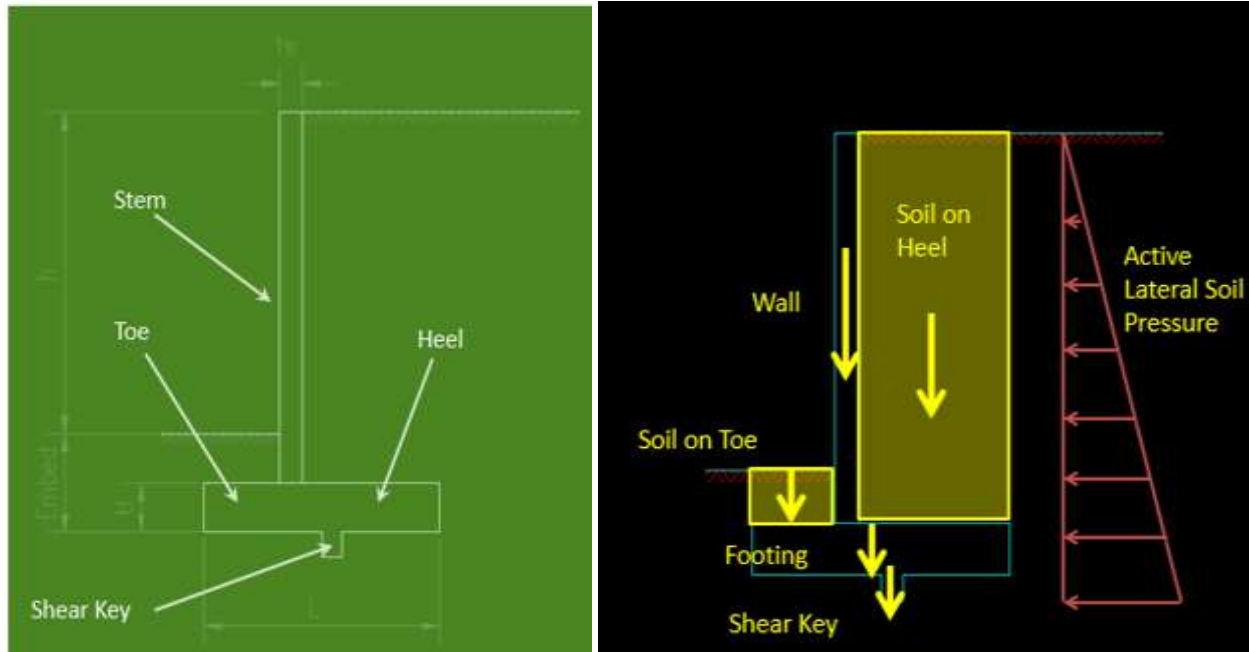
Forces Acting on Cantilever Retaining Wall
